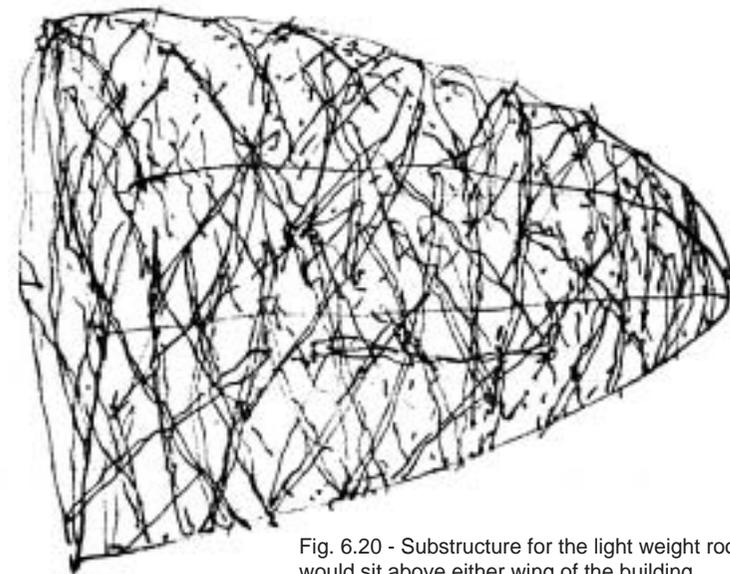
Substructure for the light weight roof which would sit above either wing of the building.
